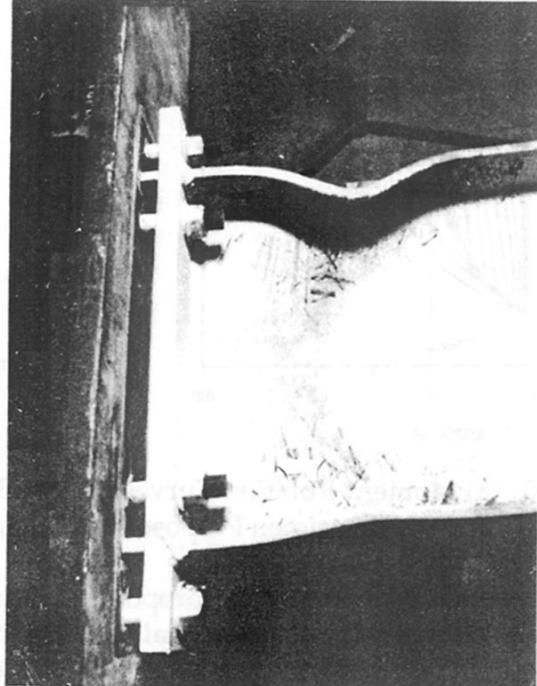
Prestressed End Plate Specimen Proposed by A. Astaneh-Asl in 1986 at the End of the Tests (Astaneh-Asl, 1986c)
